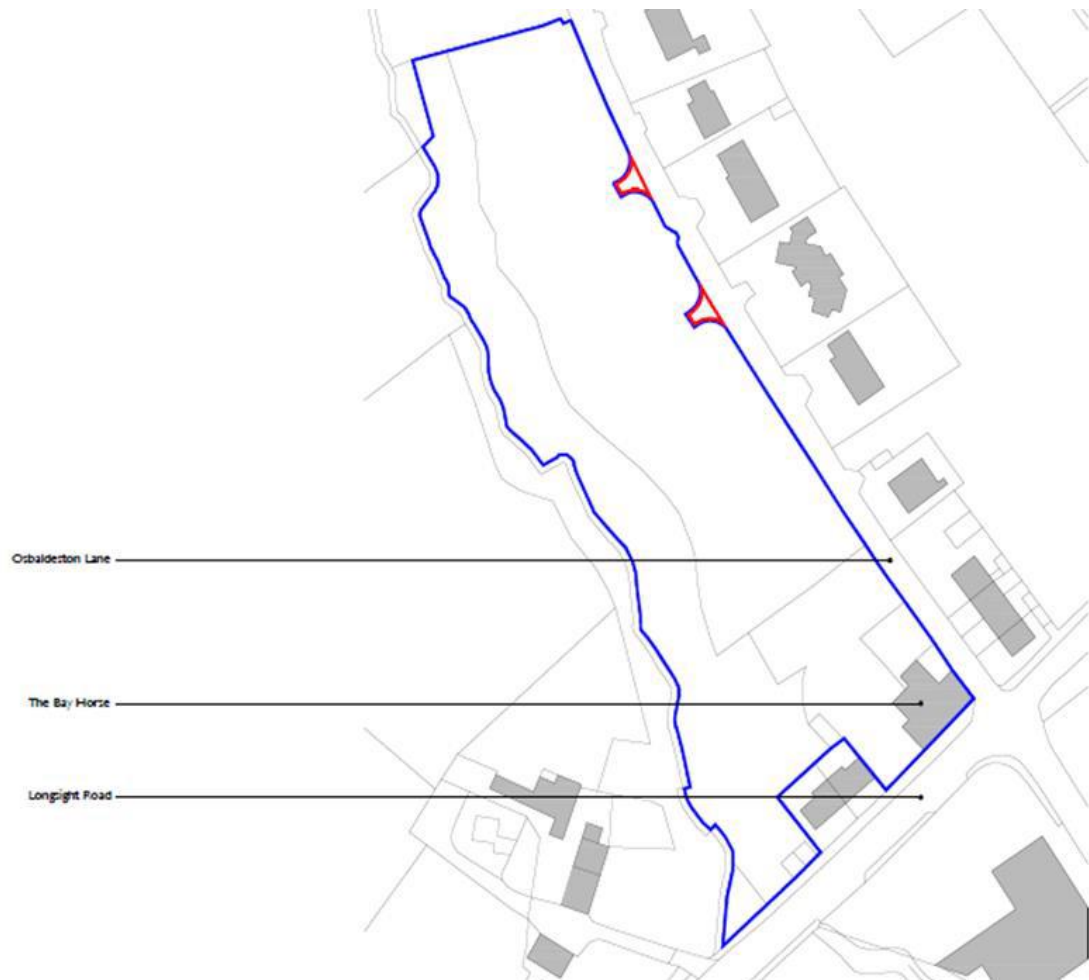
The approved site plan granted planning permission under reference 3/2017/0206.
